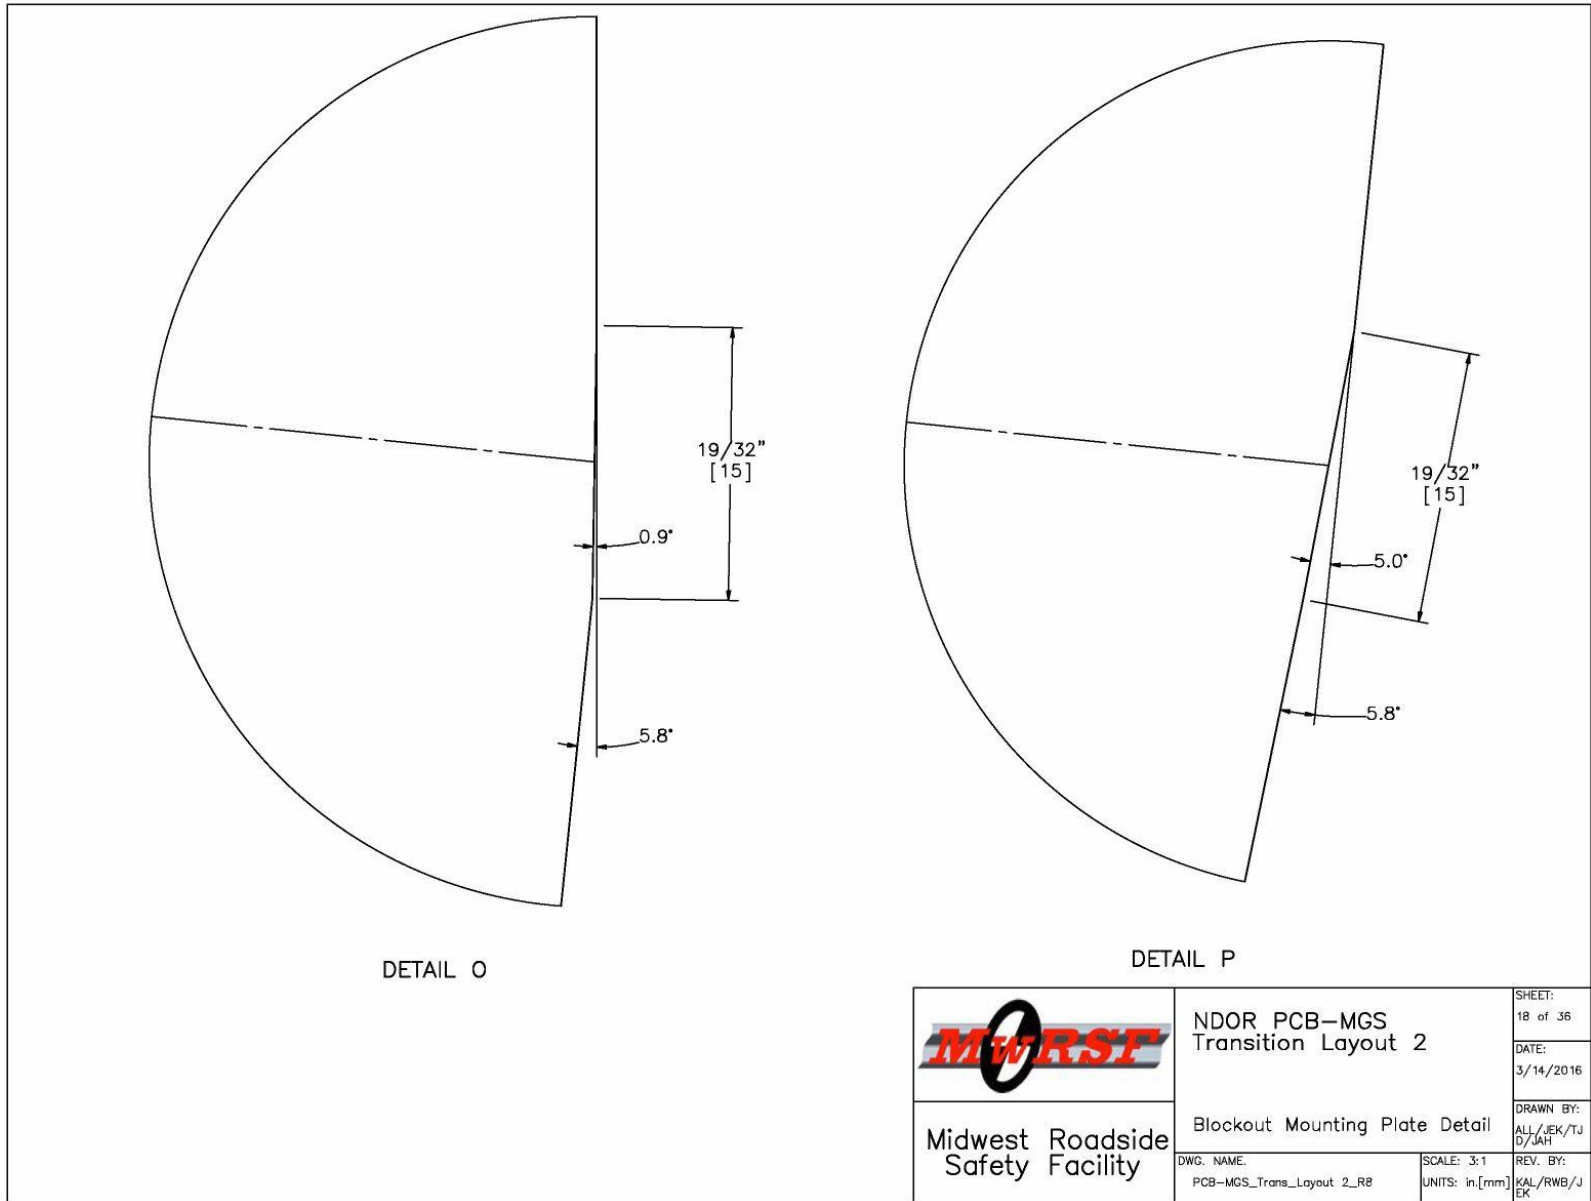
Blockout Mounting Plate Detail, Test No. MGSPCB-1
